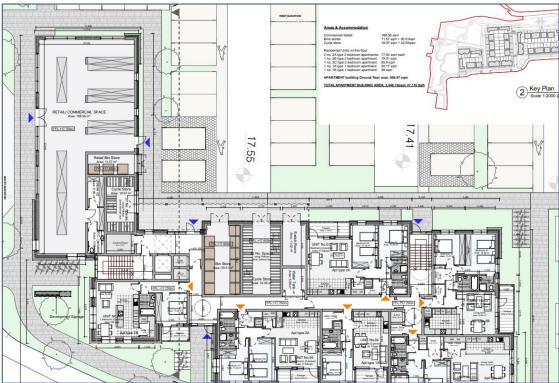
Apartment Building (GF) and Car Parking – extract of drawing 20175-3200
